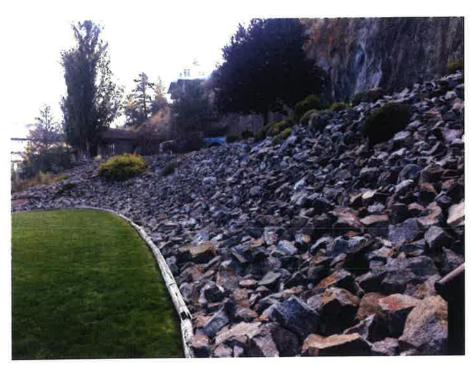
View of existing landscaped riprap along western boundary. Photo taken September 3, 2020.
